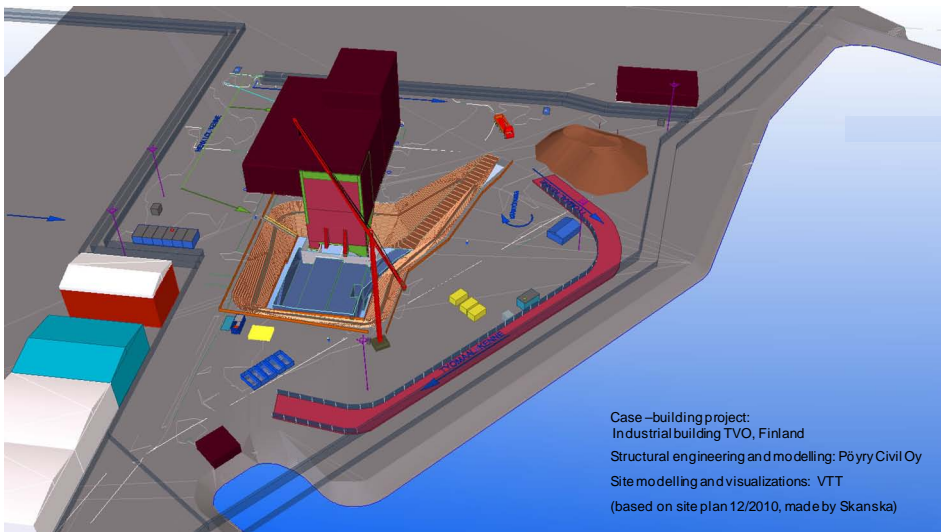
BIM-based site layout plan created using Tekla Structures modelling software in the BIM Safety pilot project II.
